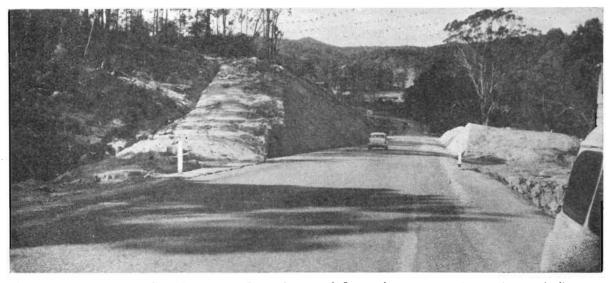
Princes Highway East, Section 6. One mile east of Genoa after reconstruction on improved alignment.
